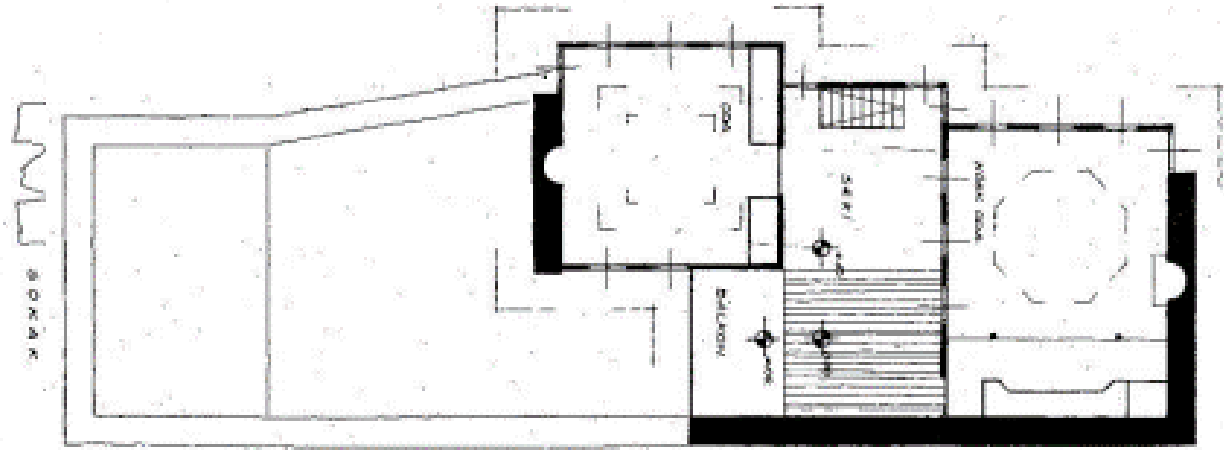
Bekir Beyler House 1<sup>st</sup> Floor Plan (Tosun, 1969)
